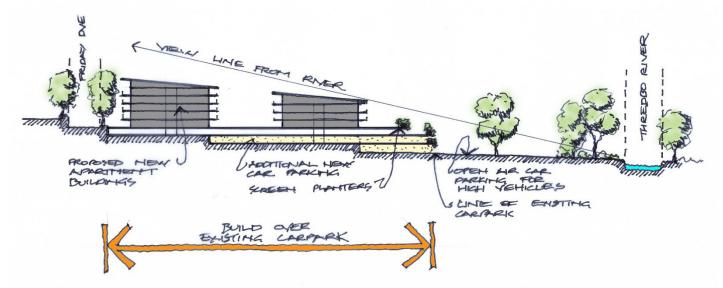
Site Section Through Friday Flat Day Car Park showing Possible Alternative Development and Additional Cars
